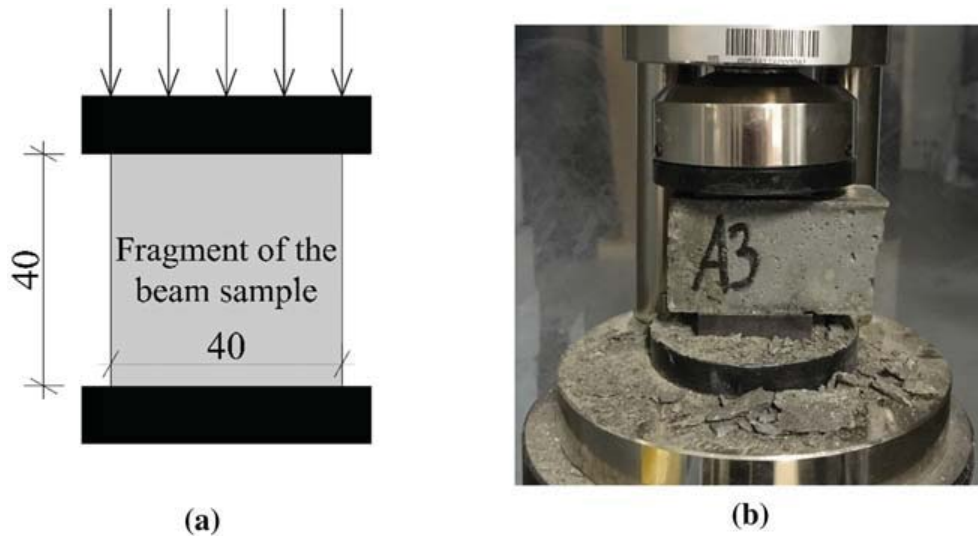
Compressive strength test: (a) mechanical test scheme; (b) part of beam sample in mechanical press.
